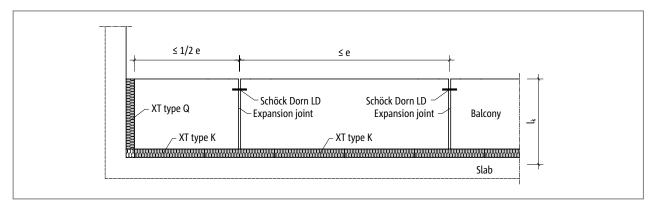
Schöck Isokorb® XT type K: Expansion joint arrangement
